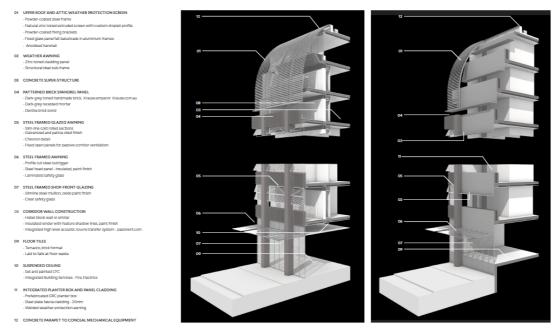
Façade detail for Building 2(A), Bourke Street elevation
